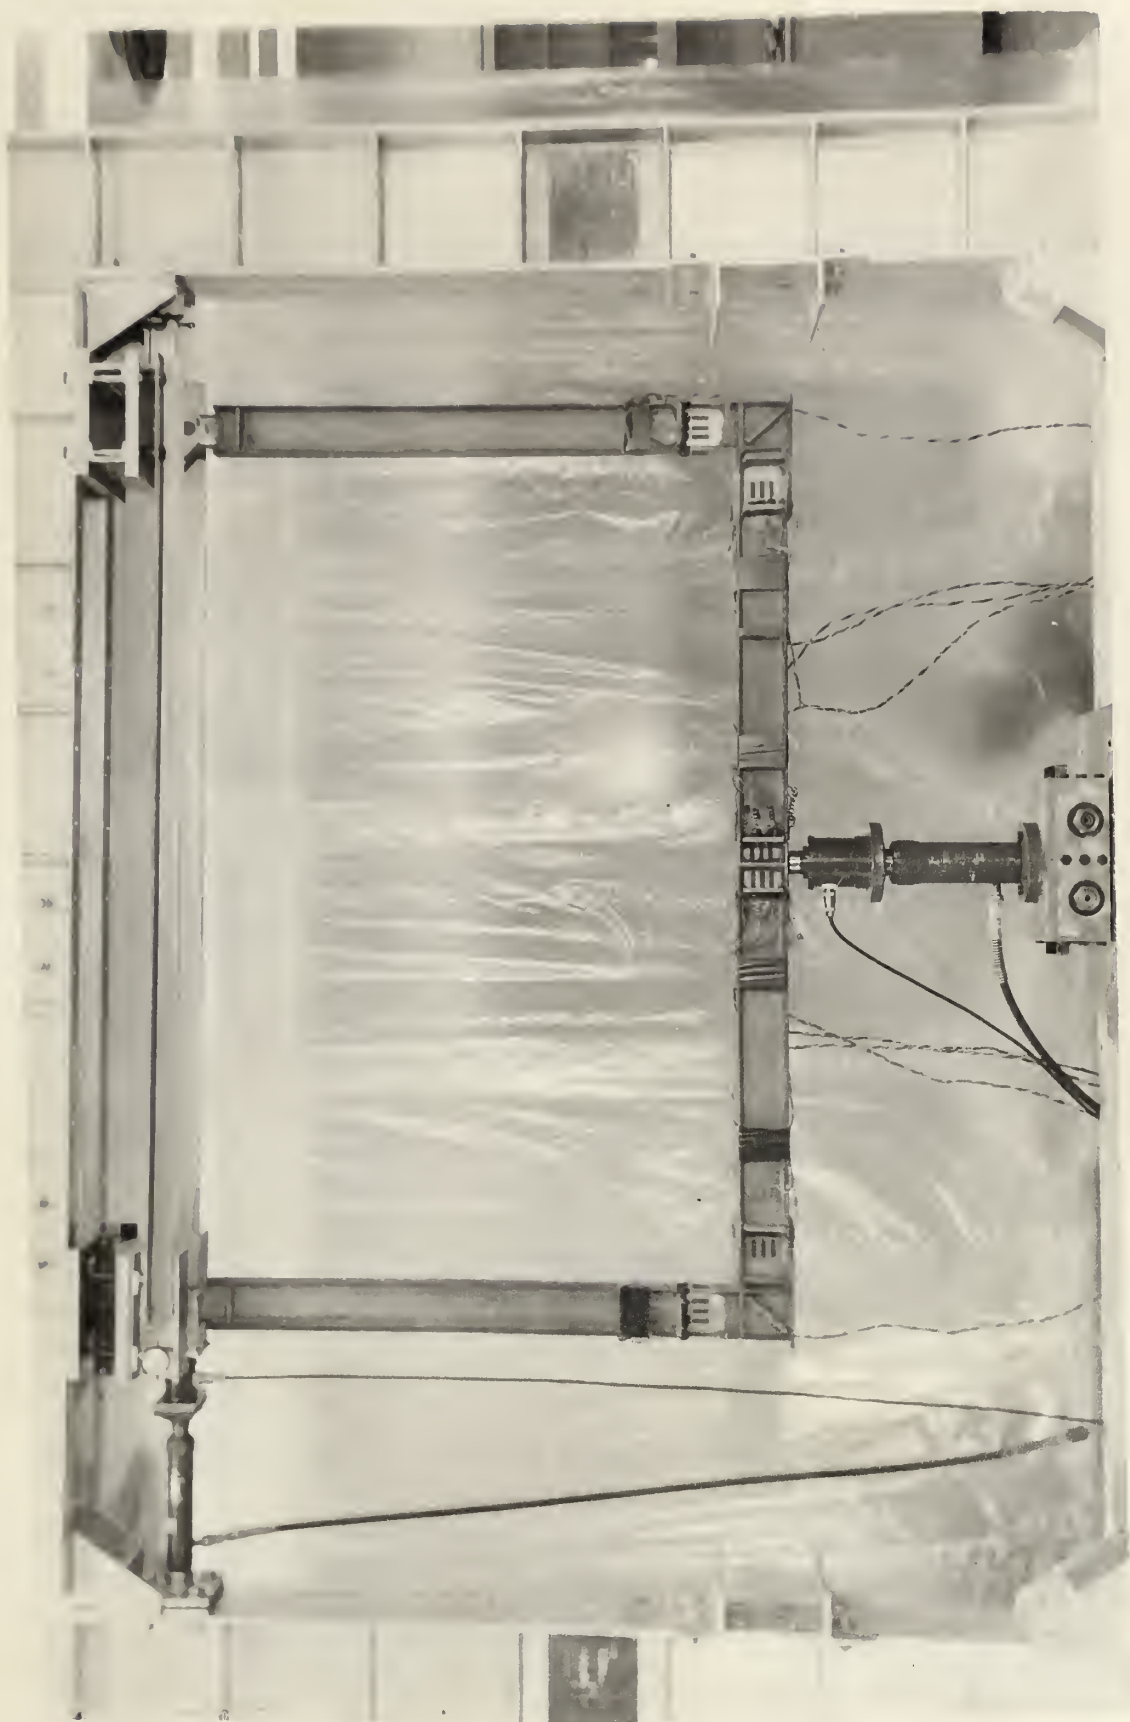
LOADING SYSTEM FOR FRAME NO. 1
